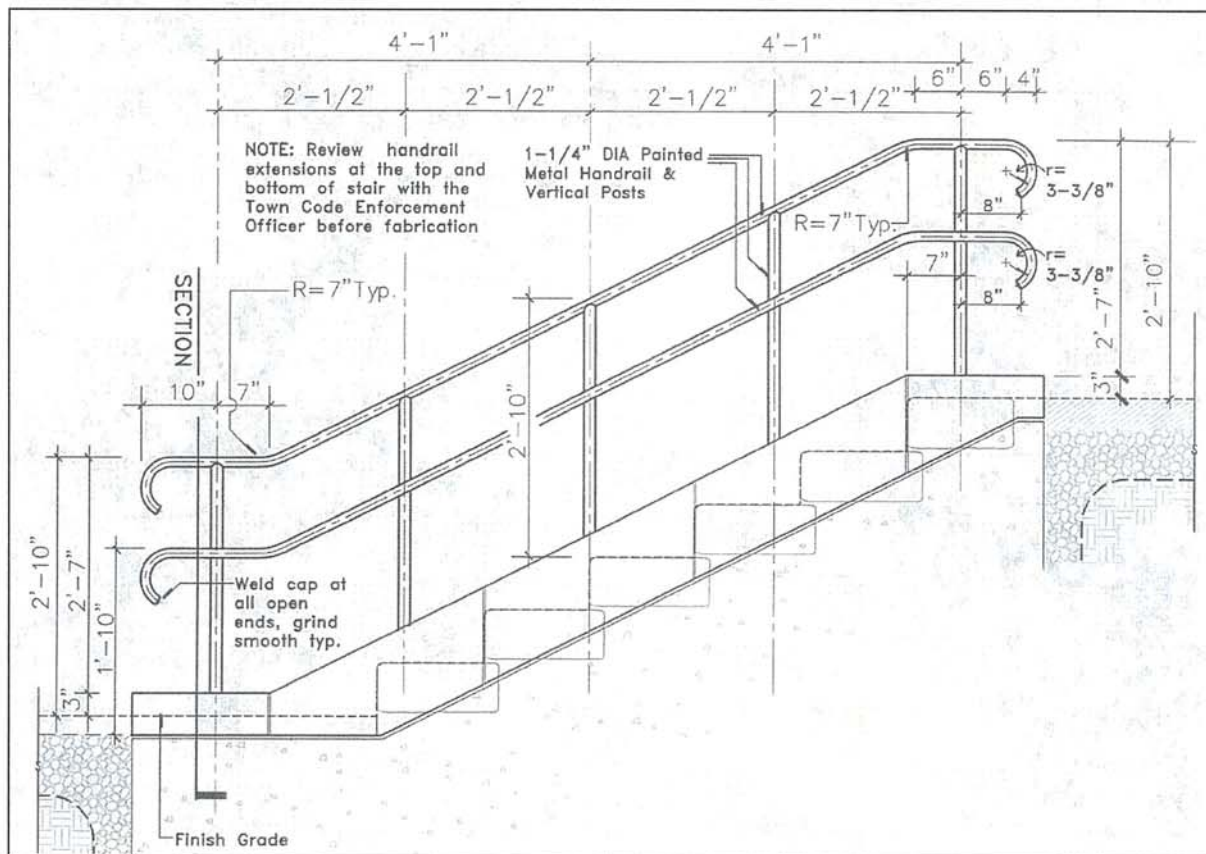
This construction detail was used to build ADA-compliant railings on steps and ramps at the Camden Garden Amphitheater and Library Grounds in Camden, Maine. It should be noted that this detail is provided as an example and is not intended for construction purposes. Courtesy Heritage Landscapes. (R-MTH-Camden-Handrail-DWG.jpg)
